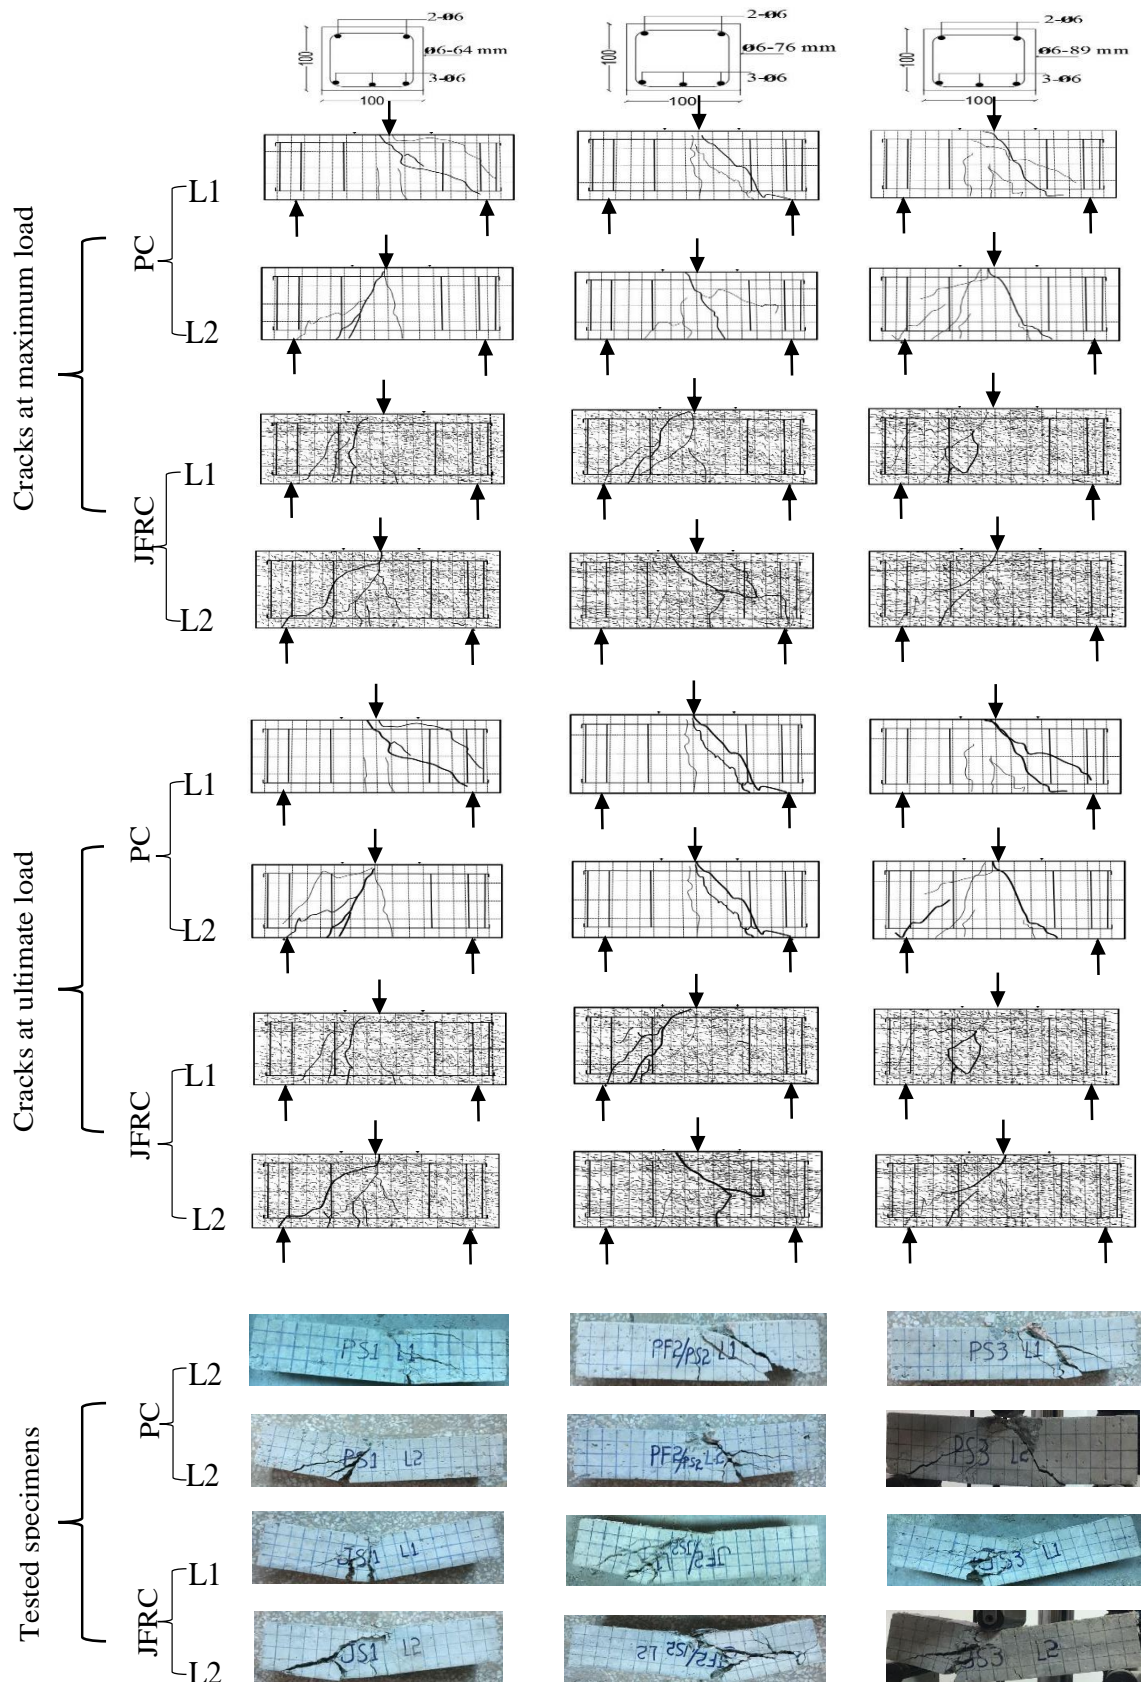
Crack propagation of PC and JFRC specimens with changing shear reinforcement and constant flexure rebars (i.e. 3-Ø6) during varying flexural loading rates
